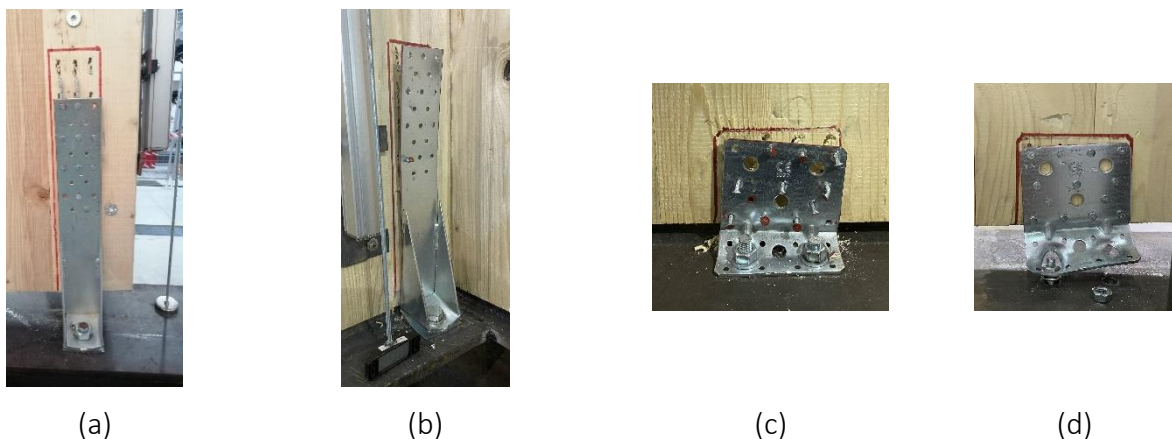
Photos of the connection failures: (a) HD of shear wall, (b) HD of perpendicular wall, (c) ABs of shear wall with failure in the nails and (d) in the horizontal flange.
